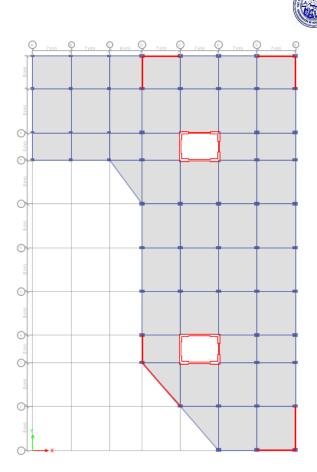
Typical Floor Plan: from base to 12 story level : Shear wall At Corner portion
